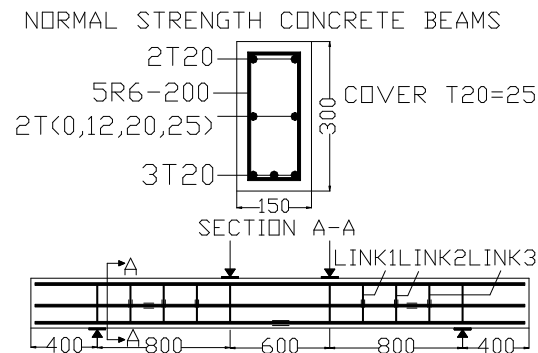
Reinforcement details and position of strain gauges for the Normal Strength Concrete test specimen
